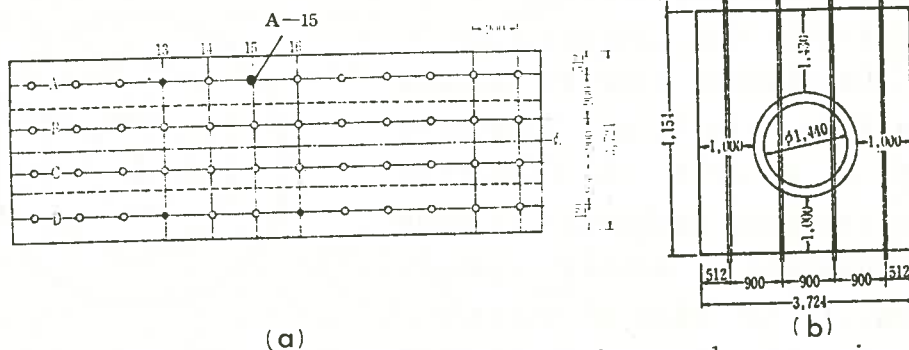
Plan and cross-section of grouting and measuring bore holes.
